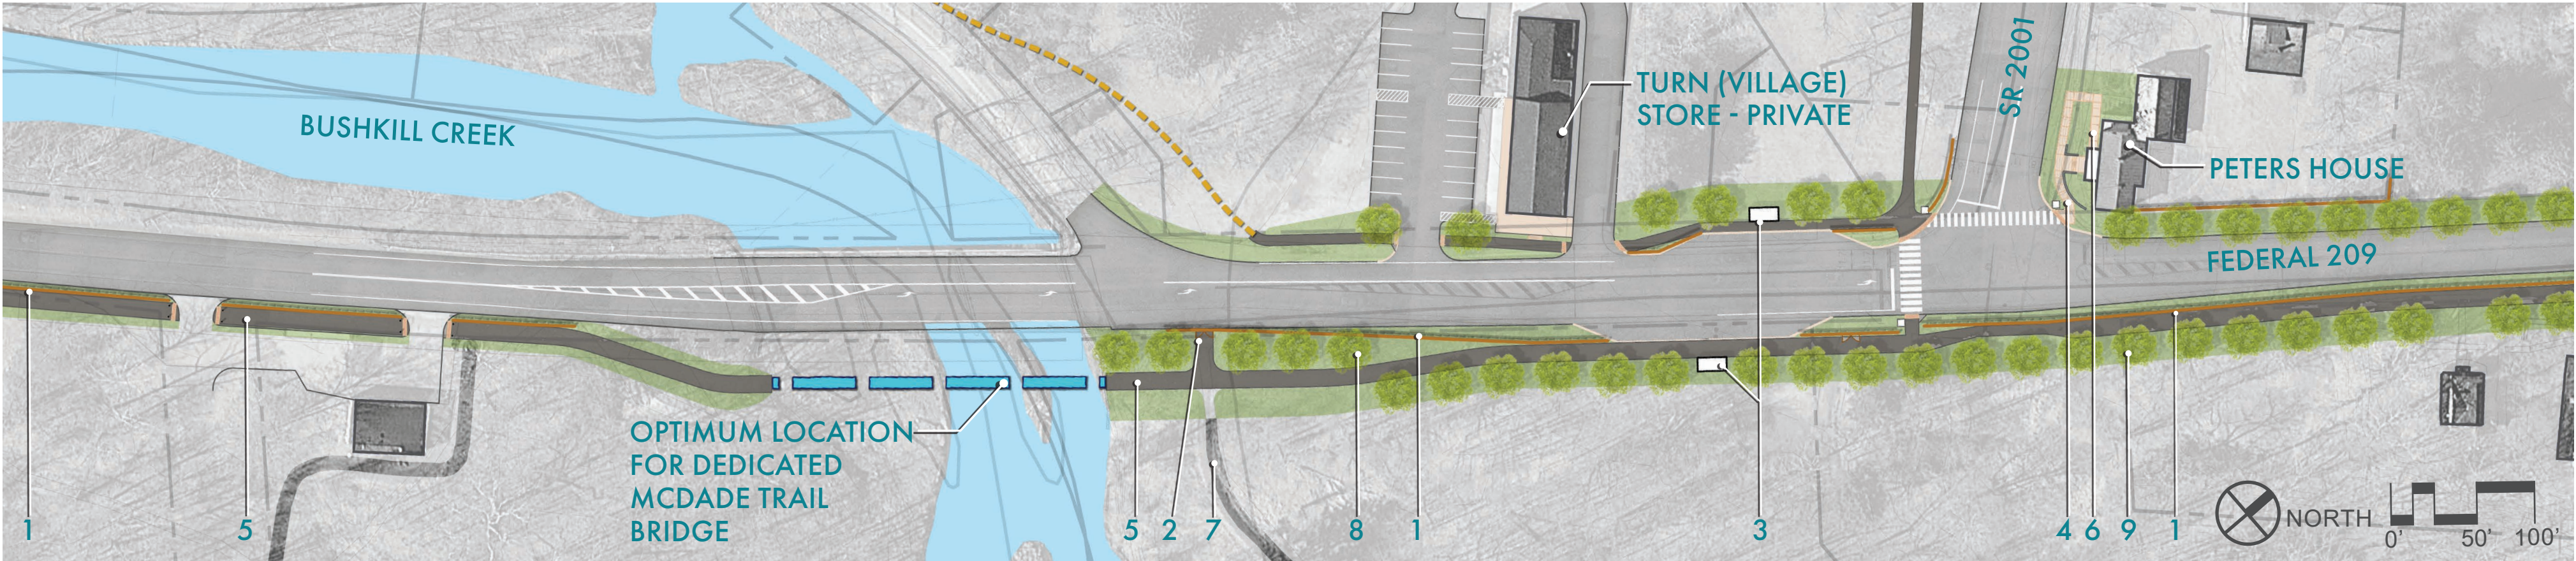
Palette of appropriate transportation-related streetscape elements for Bushkill Village. Note - highway base plan shows future lane geometry.
